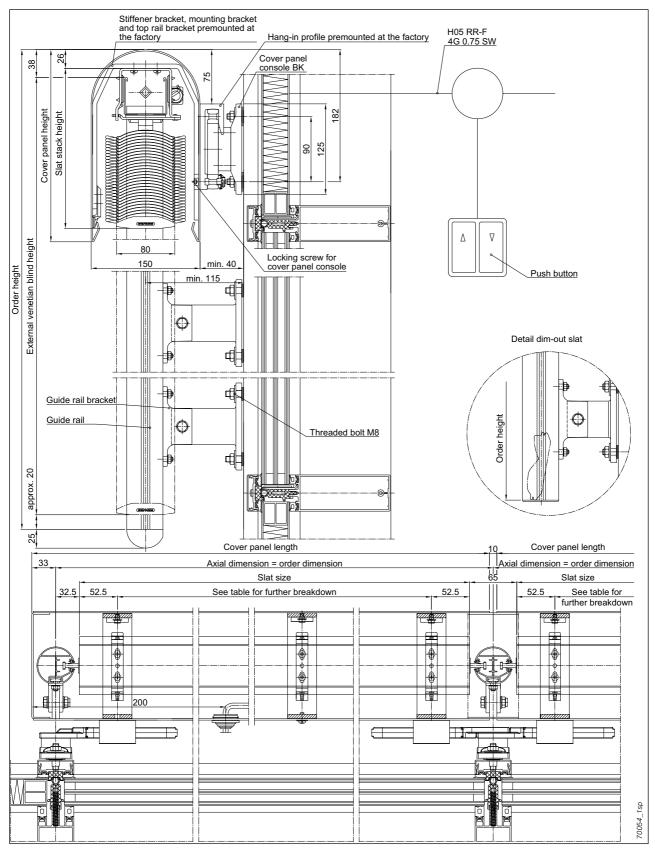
Mounting example for T/M system cover panel E 80 A6 S with round-shaped cover panel
